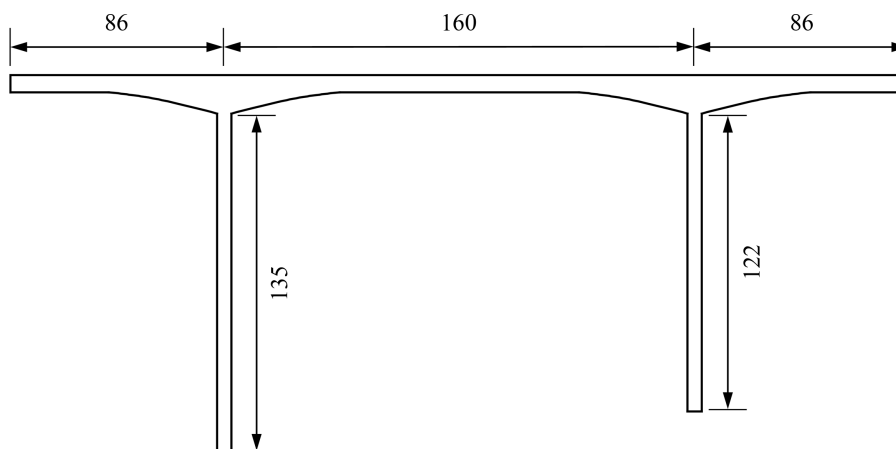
Elevation diagram of CRFB-HBSC (unit: m)
